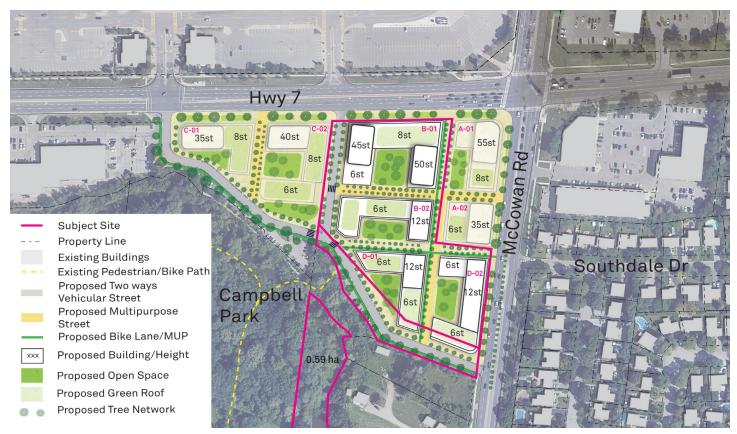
Site Plan for Block Plan Area (Brook McIlroy)
